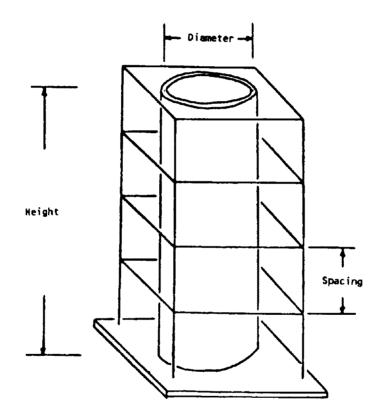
General framing plan of a mine ventilation exhaust stack.
